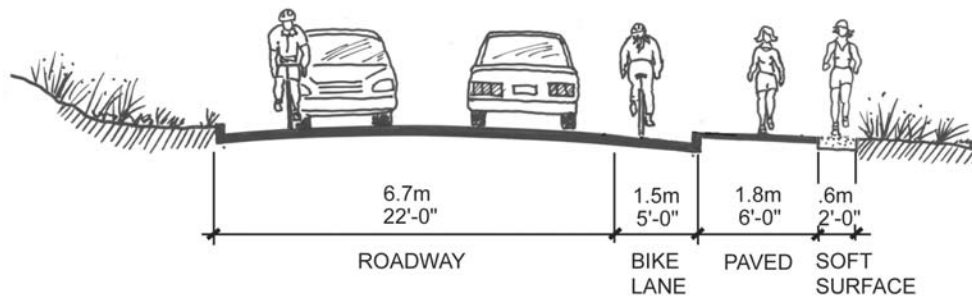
Proposed Development of Juan Bautista de Anza Trail at Battery Caulfield Road
